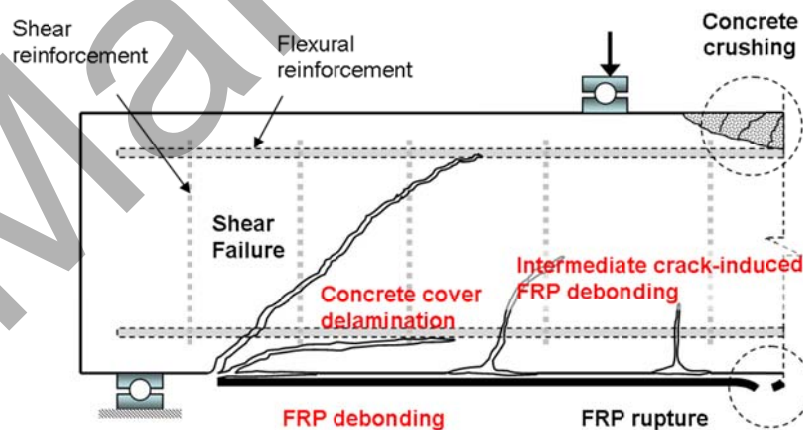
Possible failure modes in an FRP-strengthened RC beam
